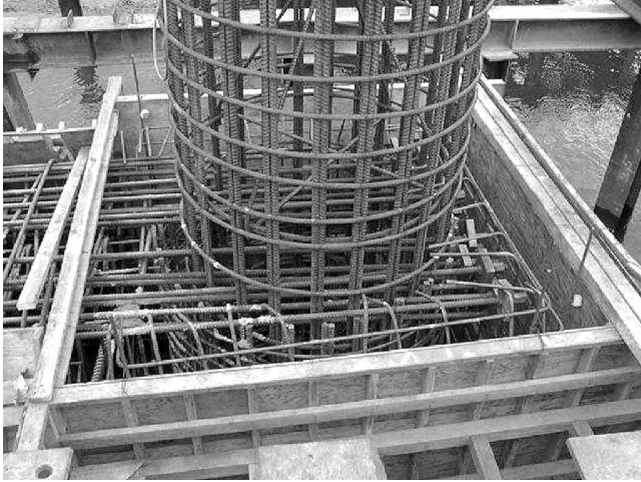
(a)—Reinforcement in a concrete column (courtesy of HDR Engineering, Inc.).
